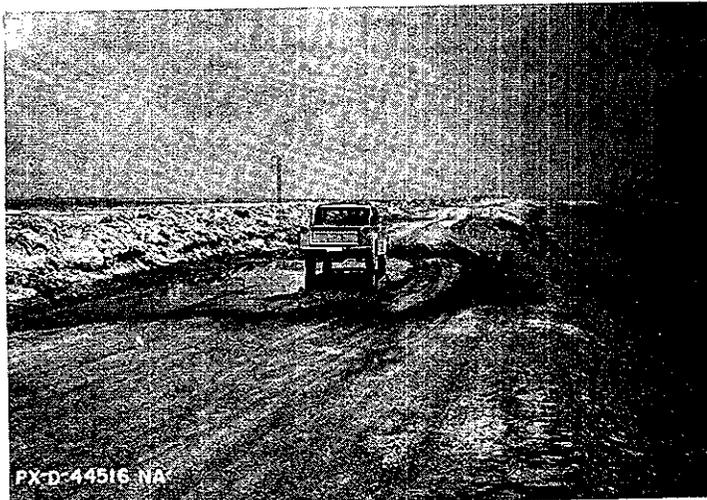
Canal bank. Mudhole formed on canal roadway by blocking drainage with material removed from canal when cleaning.
